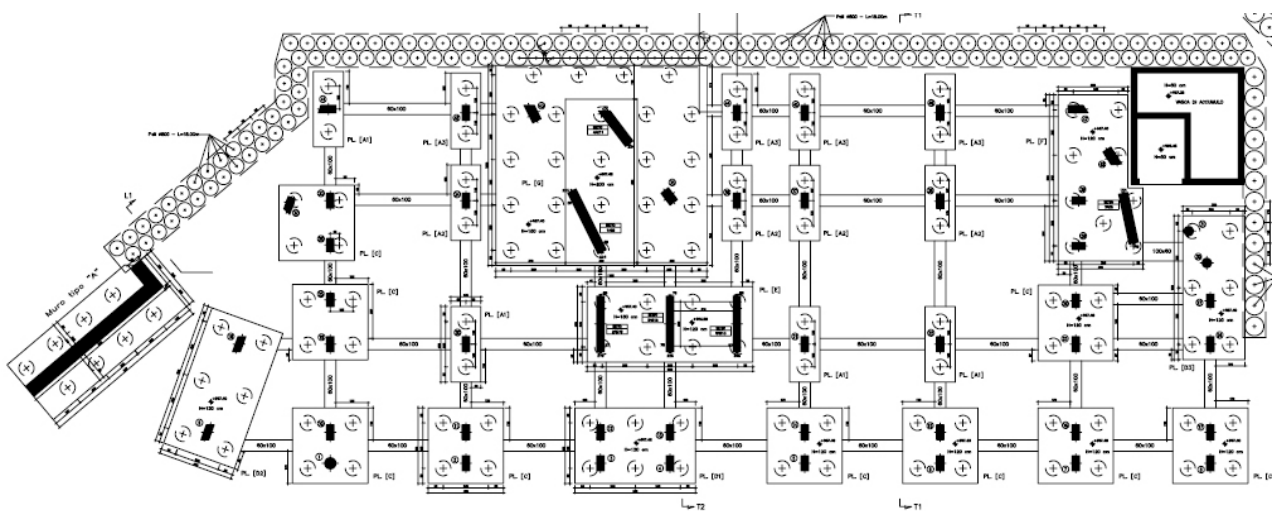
Plan view of "Casa dello Studente" building foundations and monitored sheet pile wall.
